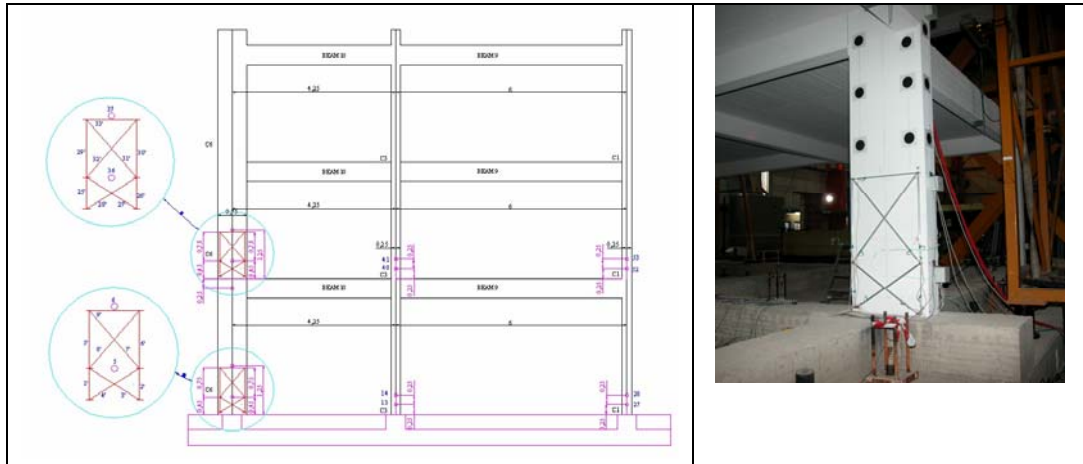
Inclination meters on the rectangular column C6.
